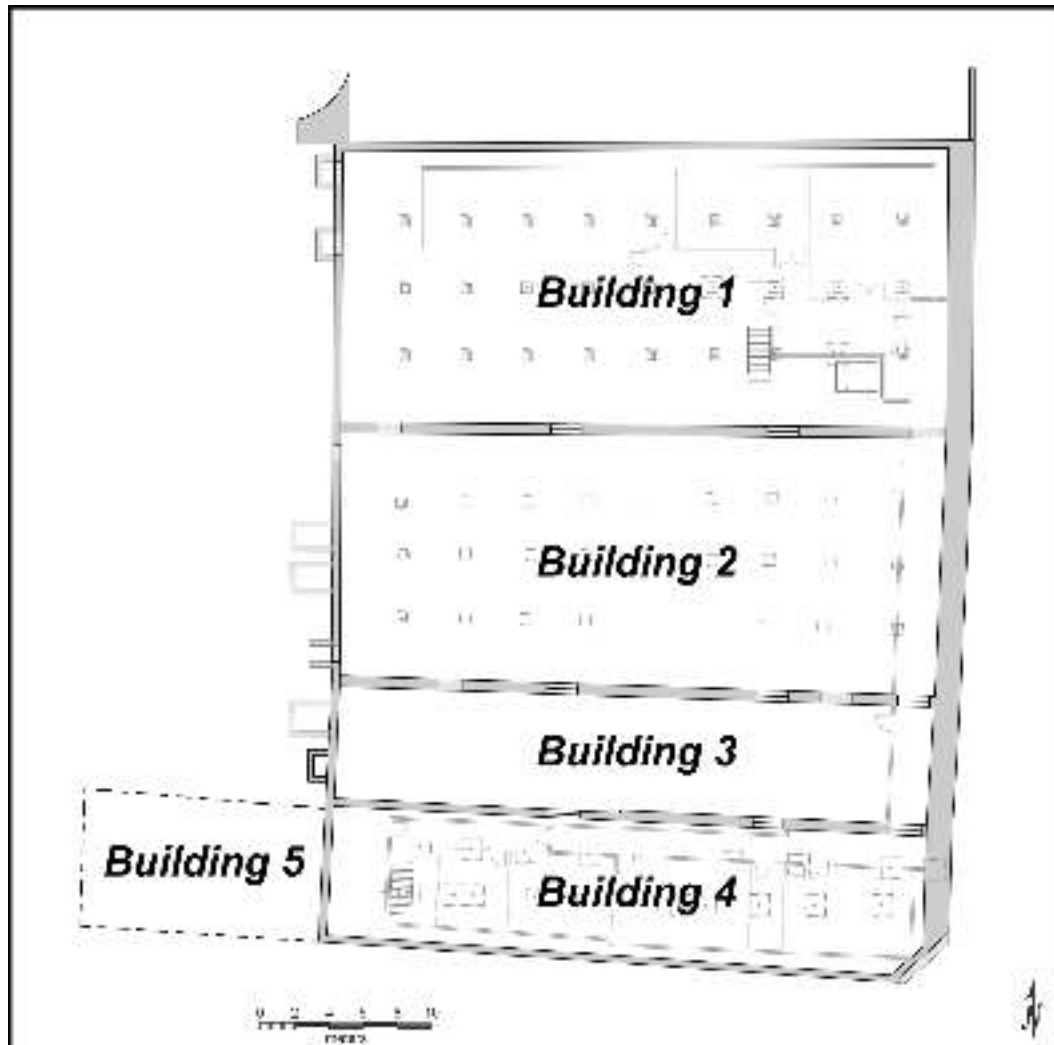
Building designations for the Plaza de Armas Buildings.
